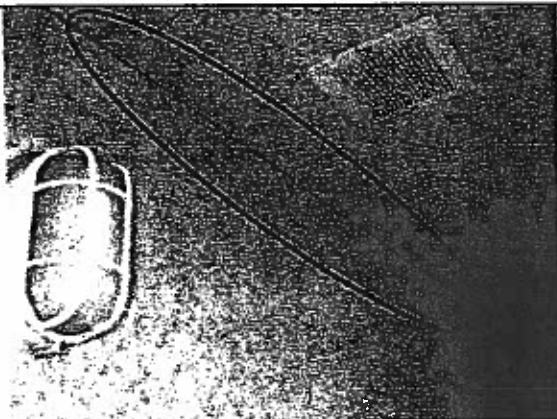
Level 4 exterior corridor: note crack in stucco between wall and soffit, which indicates building movement.
